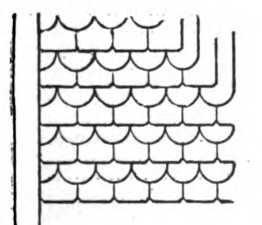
Design Formed of Slate Shown in Figs. 7 and 29.
